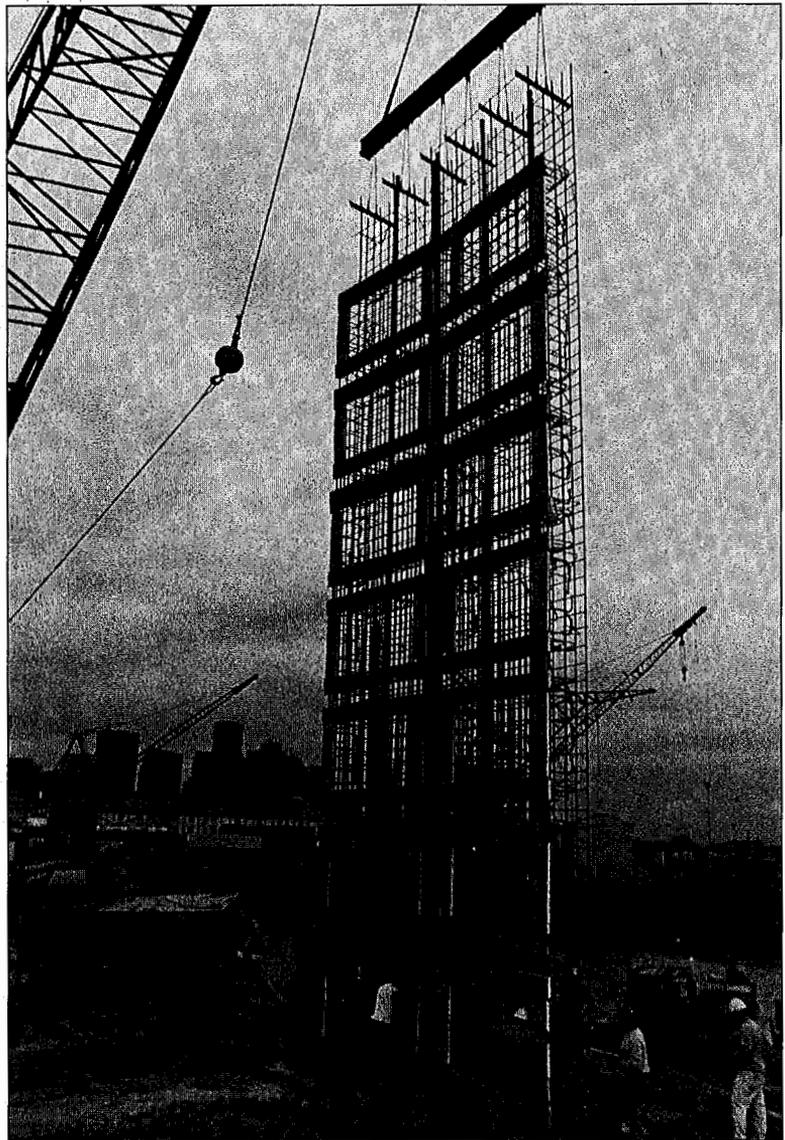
Installation of a reinforcing steel cage for a slurry wall panel. Each set of formed blockouts provides shear capacity between the slurry wall panel and one ring beam.
